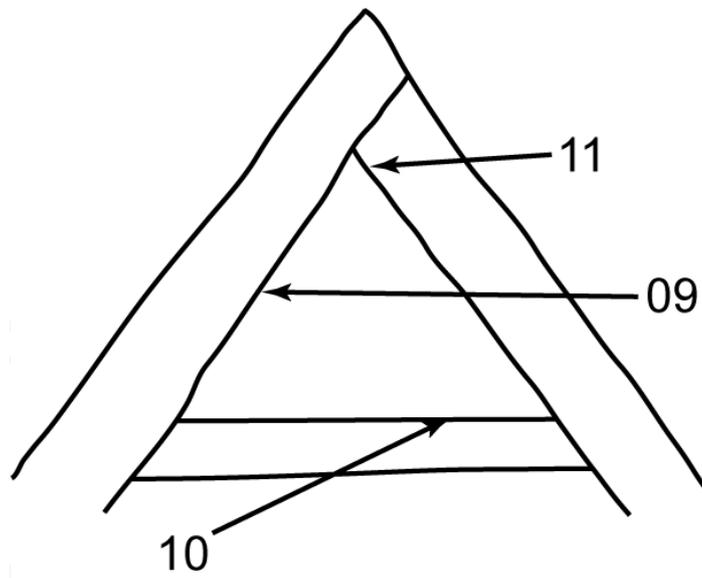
Cross-wing, truss 2, east face, showing the location of samples 09–11
